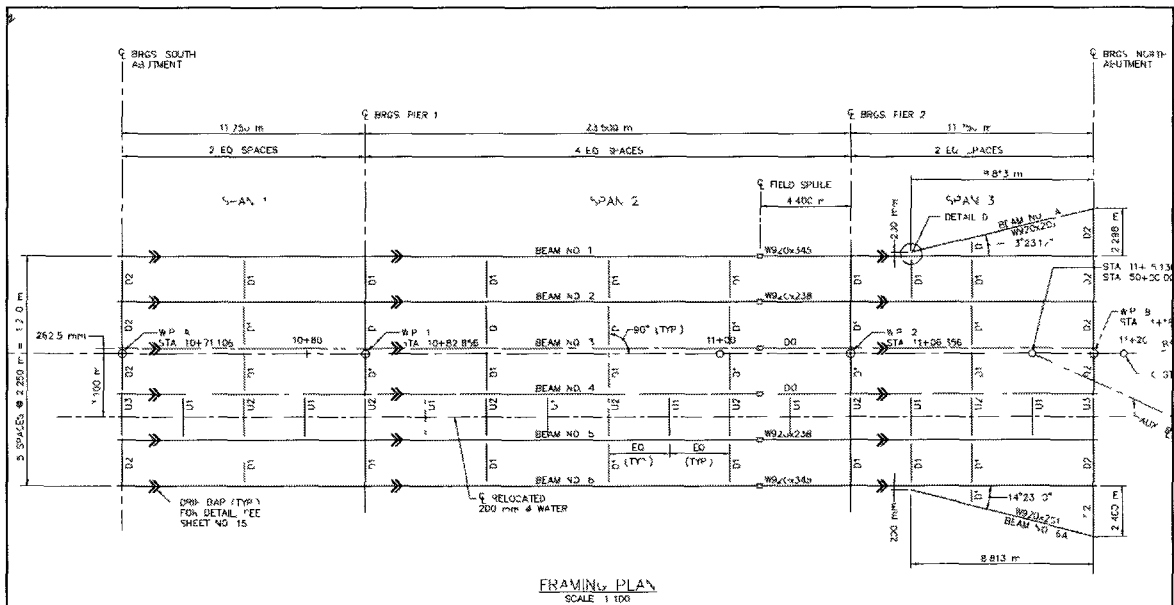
Framing plan of the Vernon Avenue Bridge.
